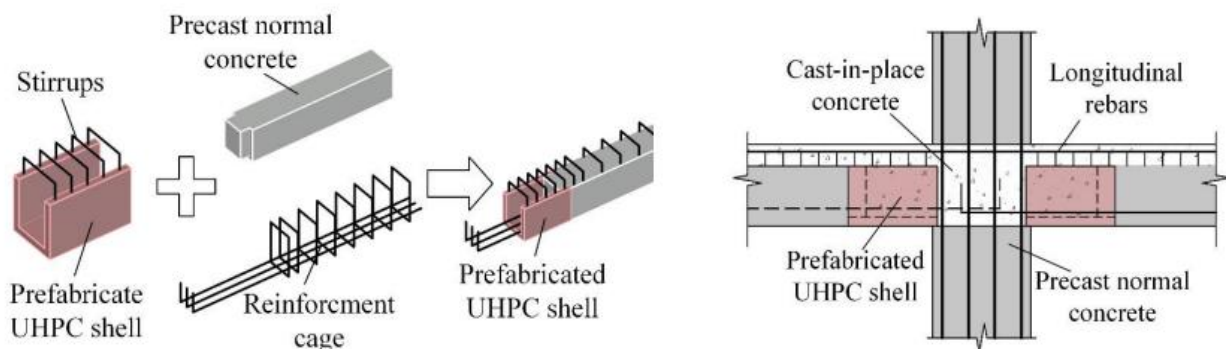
Schematic of the novel precast beam-to-column connection [15]
